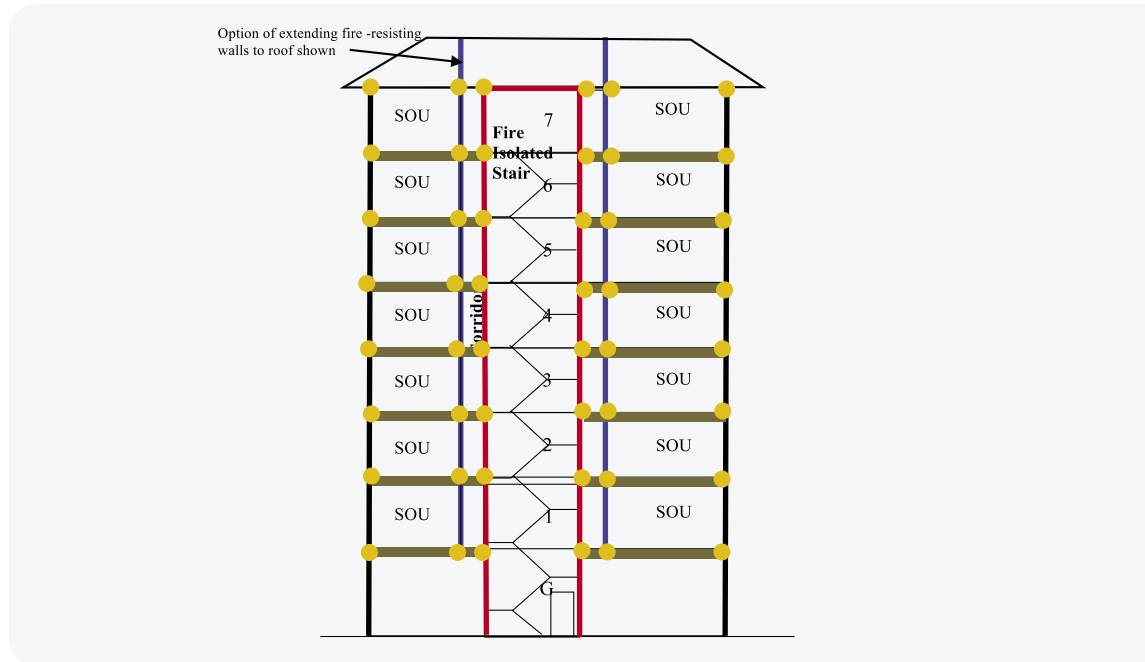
Vertical section of an apartment building showing typical cavity barrier positions.
